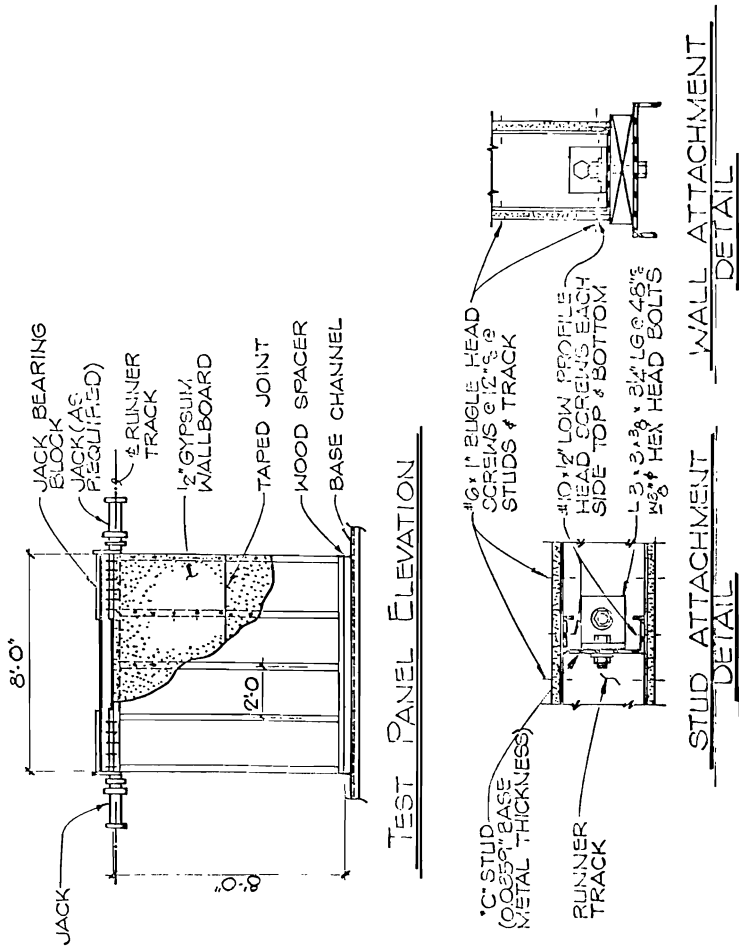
Test Assembly Plan & Details - Wall Type "A"
